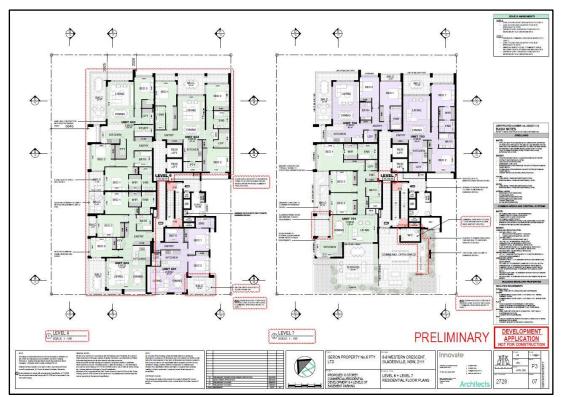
Proposed Level 6 + Level 7 Residential Floor Plans
